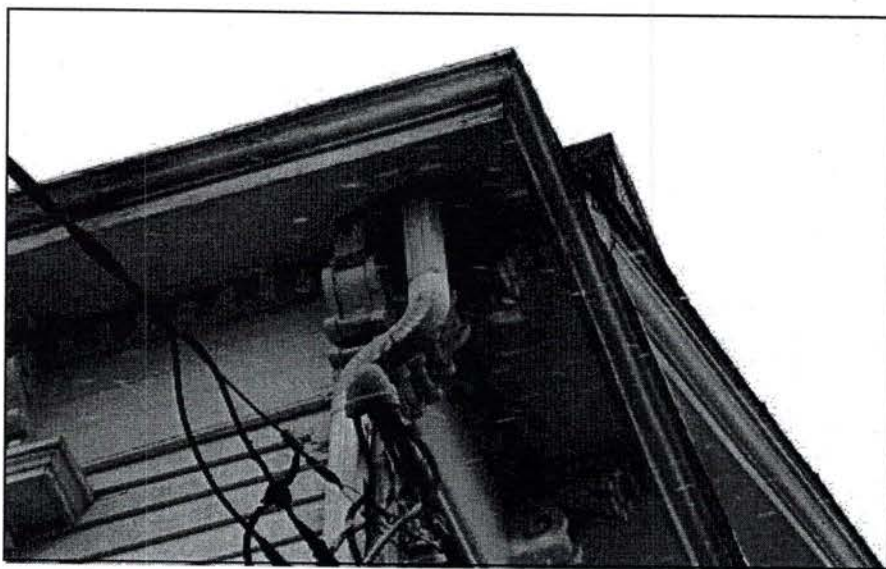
Gutter damage at the northeastern corner of the main section of the house. Biological growth is seen around gutter, leader is rusting and wood soffit is cracking.
